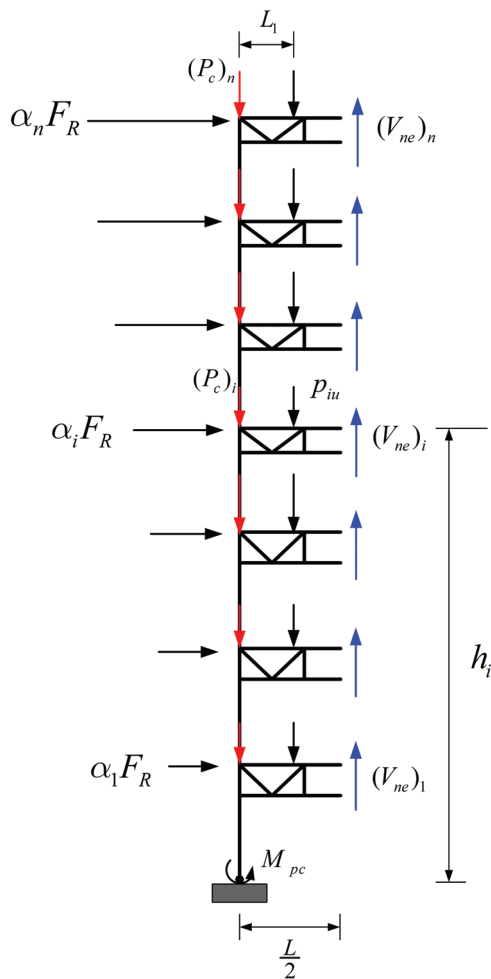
Free-body diagram of an exterior column and associated truss girder branches with concentrated gravity loadings on truss girders (lateral forces acting to right side).
